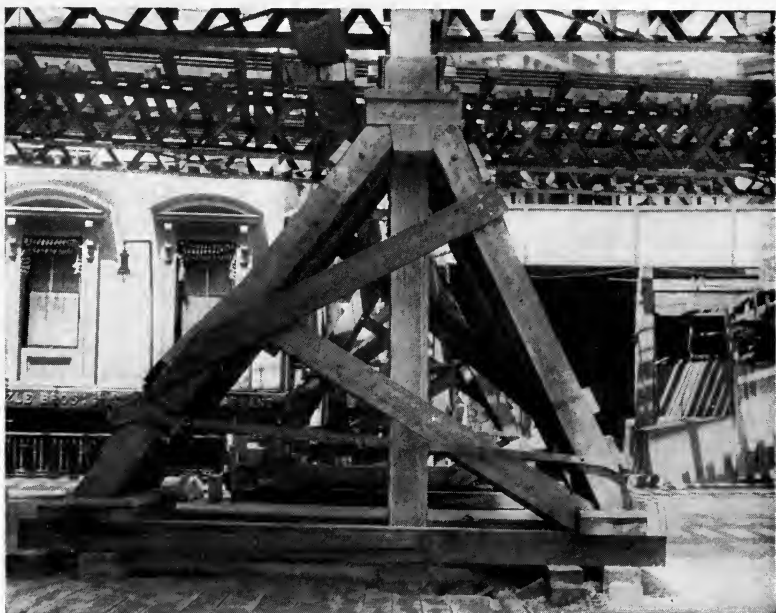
Showing Method of Temporarily Carrying Elevated Railroad Columns
